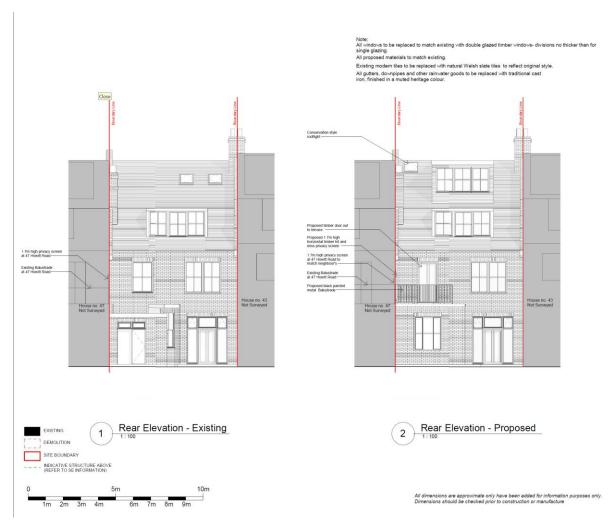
Existing and proposed rear elevation (Source: submitted documents)
